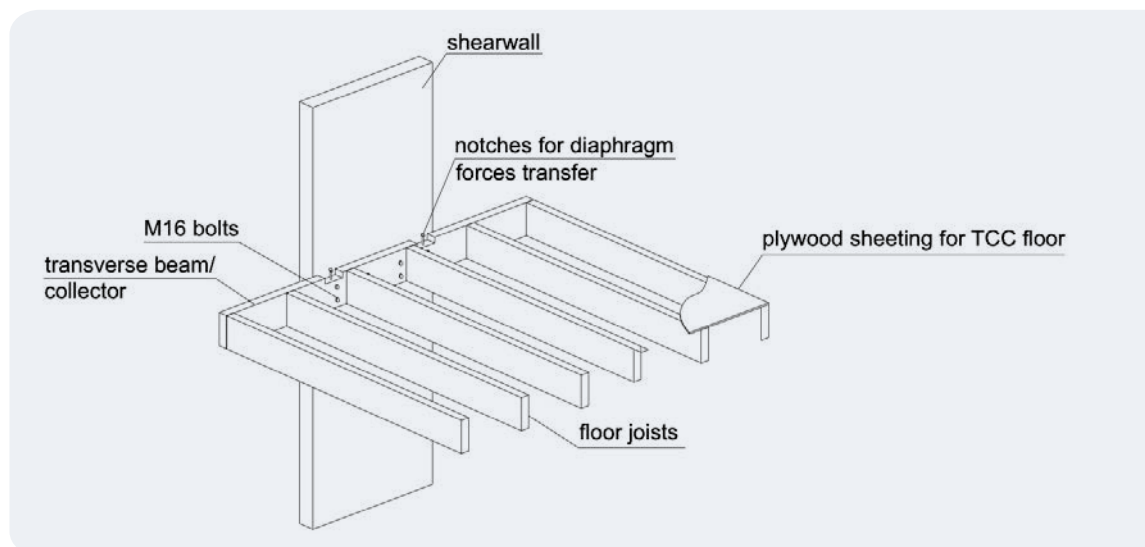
Transverse beam with notches for the diaphragm force transfer.
